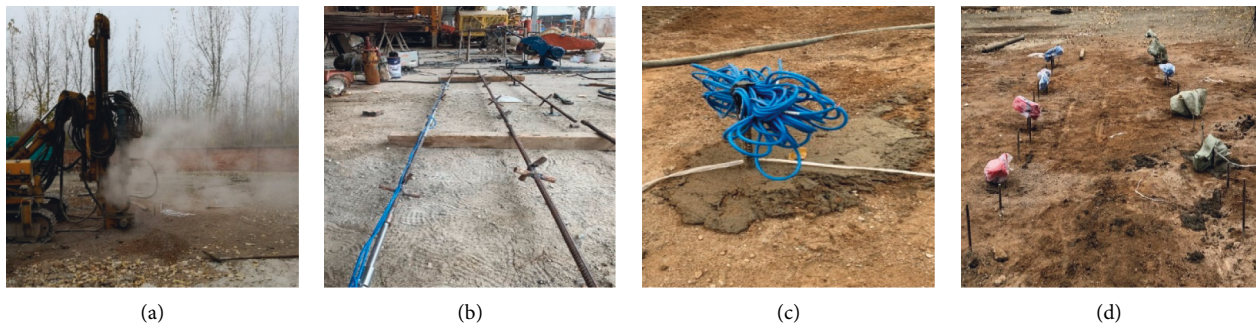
Construction of pile. (a) Drilling hole. (b) Assembly process of main reinforcement. (c) Grouting of retaining pile. (d) Completion of pile construction.
